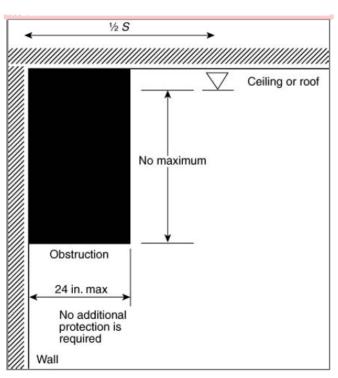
(c) Obstructions Against Walls (SSU/SSP).
